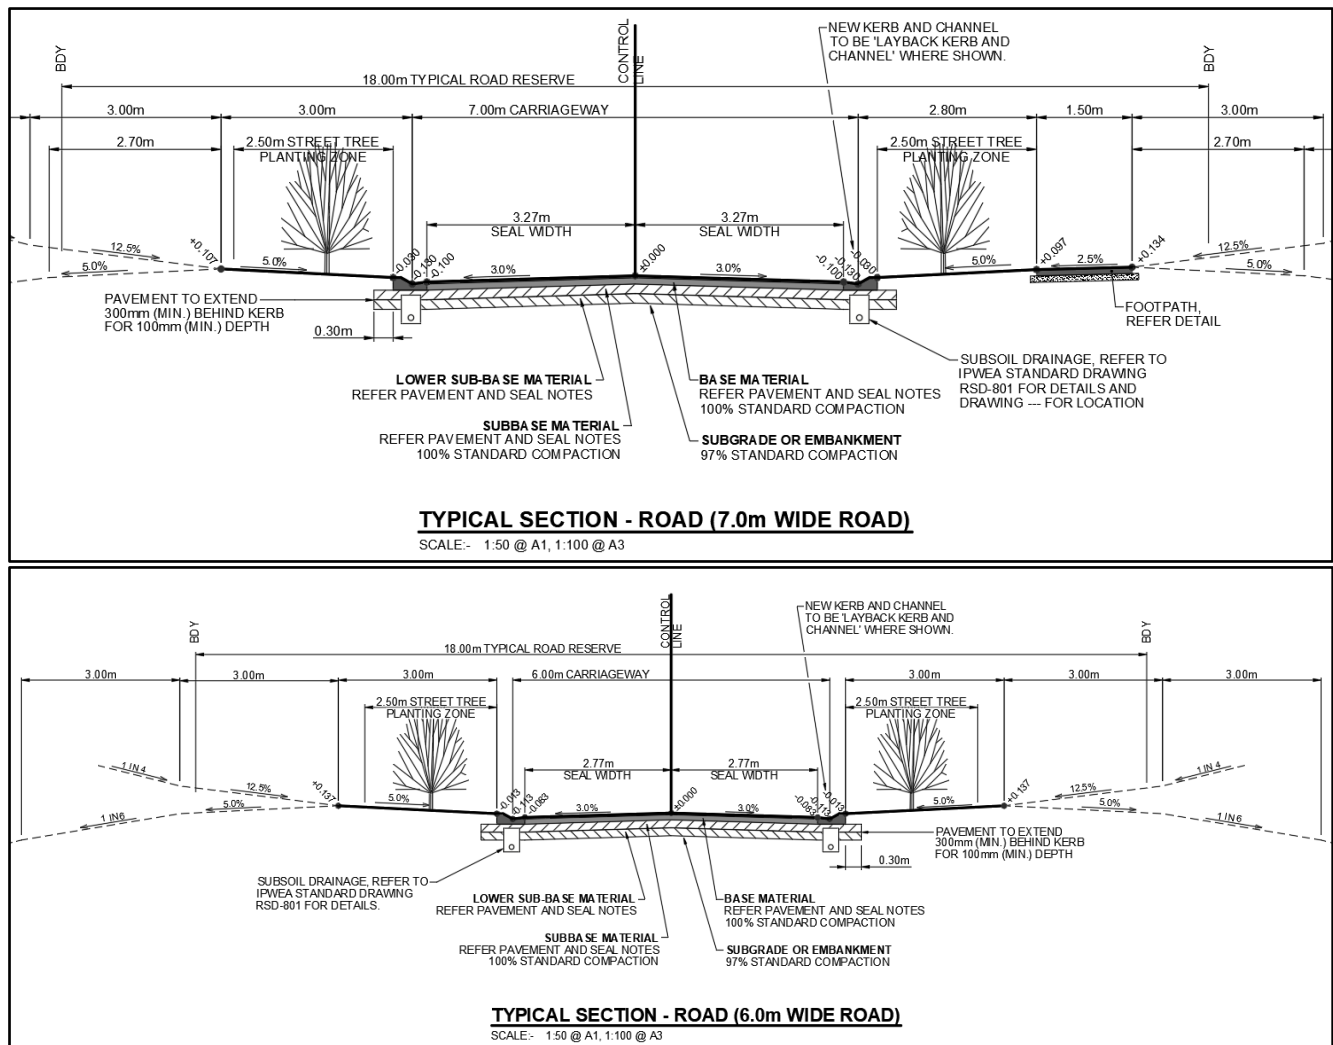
NEW INTERNAL ROAD RESERVE TYPICAL CROSS-SECTIONS
